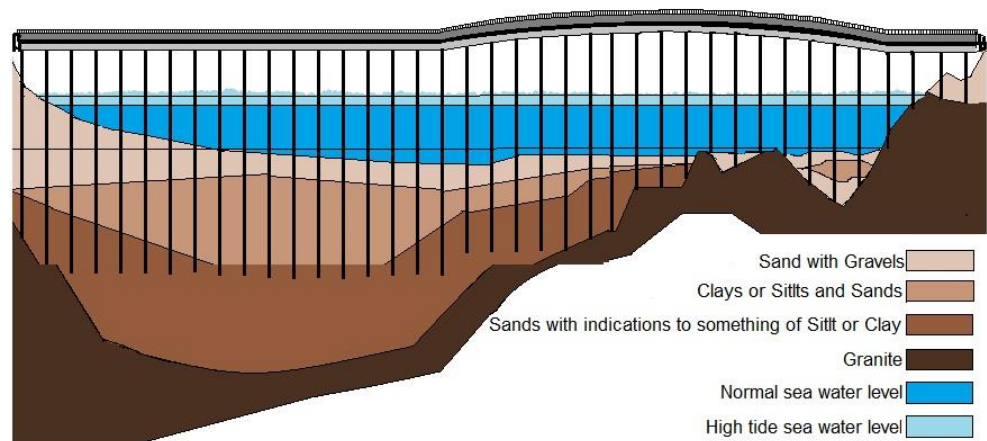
The total view of the piers and deck of Spain’s reinforced concrete coastal Arosa bridge.
